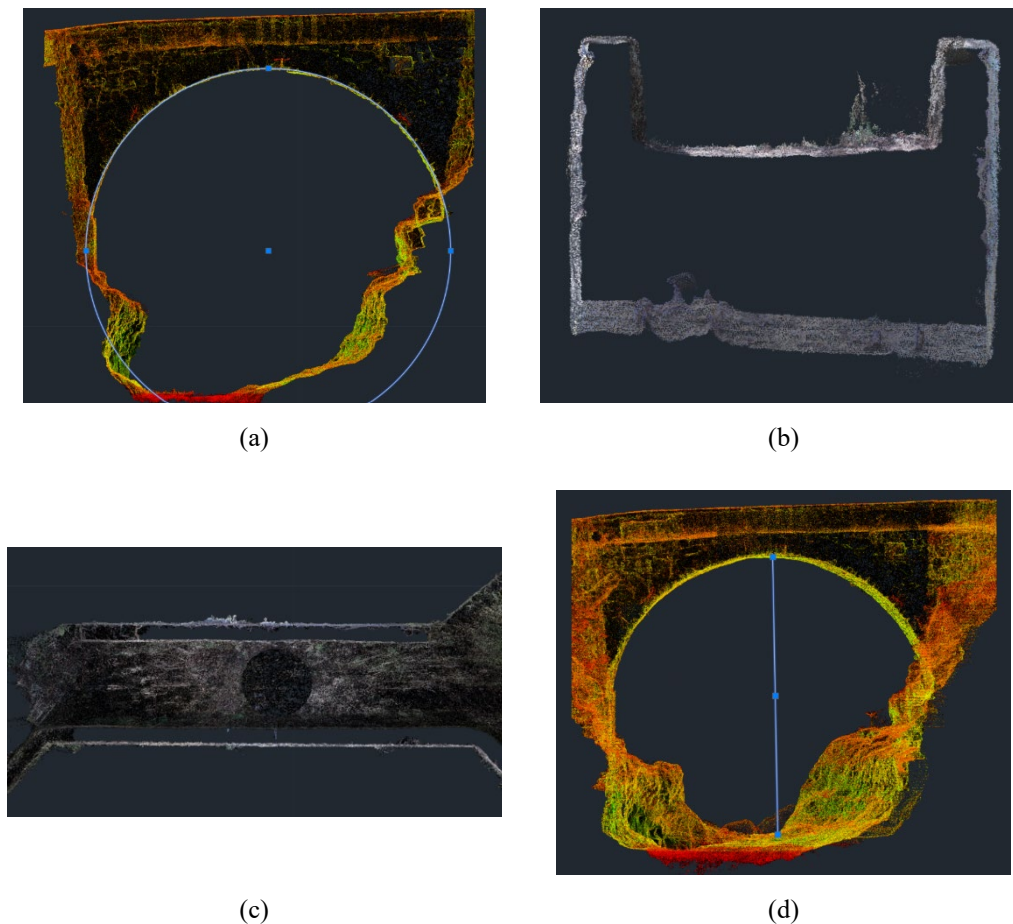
Construction components for Kouvaras bridge (a) adjusted circle, (b) Section of the pavement, (c) top view and (d) arc height [Authors].
